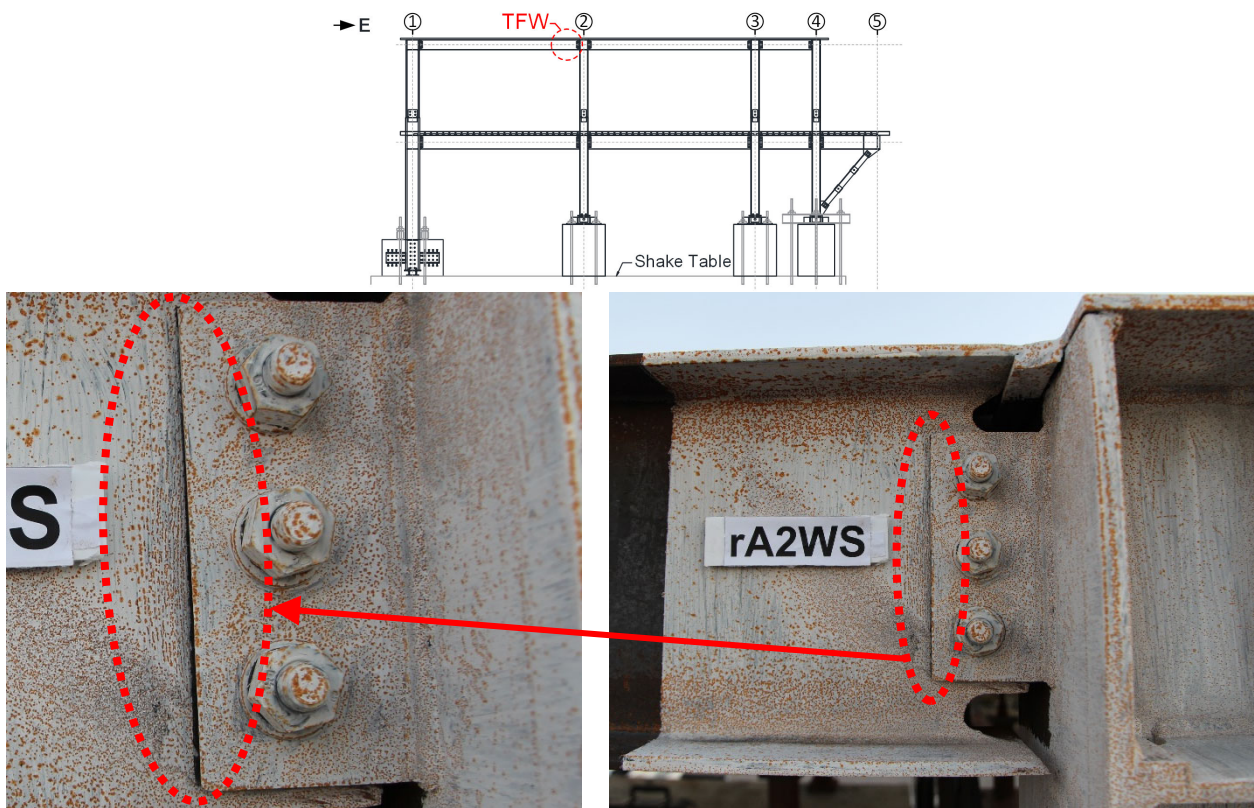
After Test 2B-5 Bolt Slippage at Roof West-Side TFW Connections
